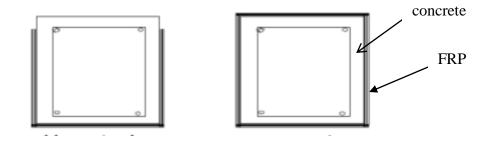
(a) U strip and (b) total wrap of FRP on beams.
